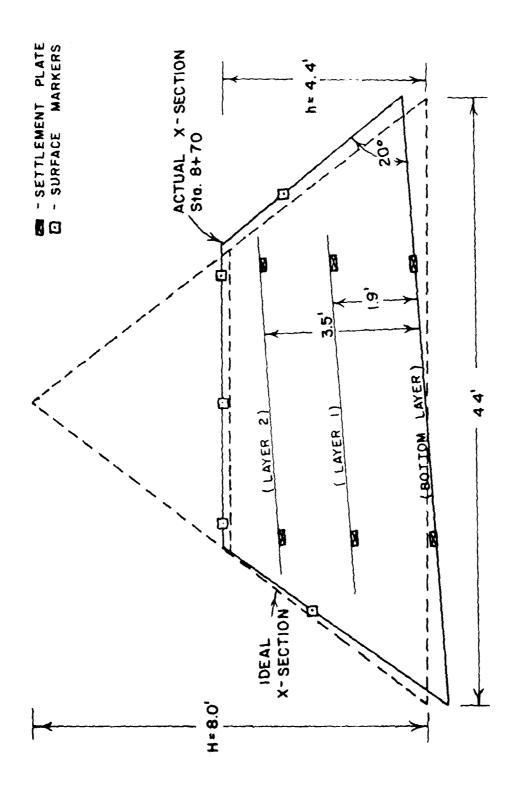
IDEAL AND ACTUAL CROSS-SECTIONS OF THE EMBANKMENT.
